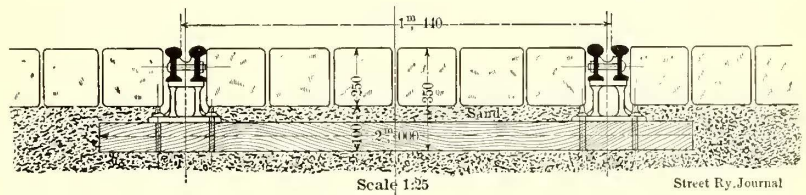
CROSS SECTION OF TRACK LAID WITH MARSILLON RAILS
